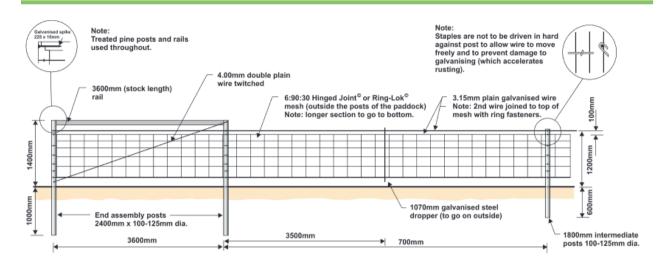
Simple fence design for North Beach dune restoration, Wallaroo.
